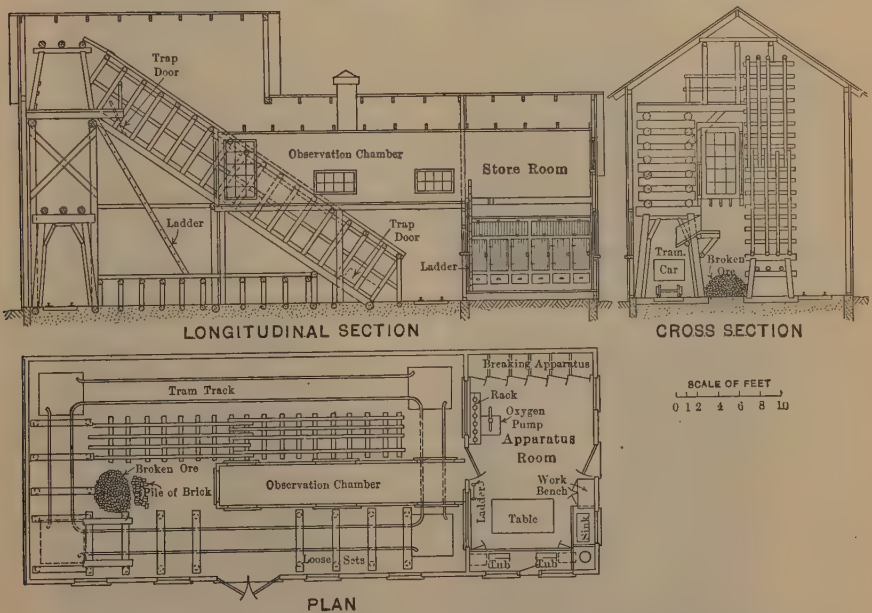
ARRANGEMENT OF APPARATUS IN FIRST-AID BUILDING.
